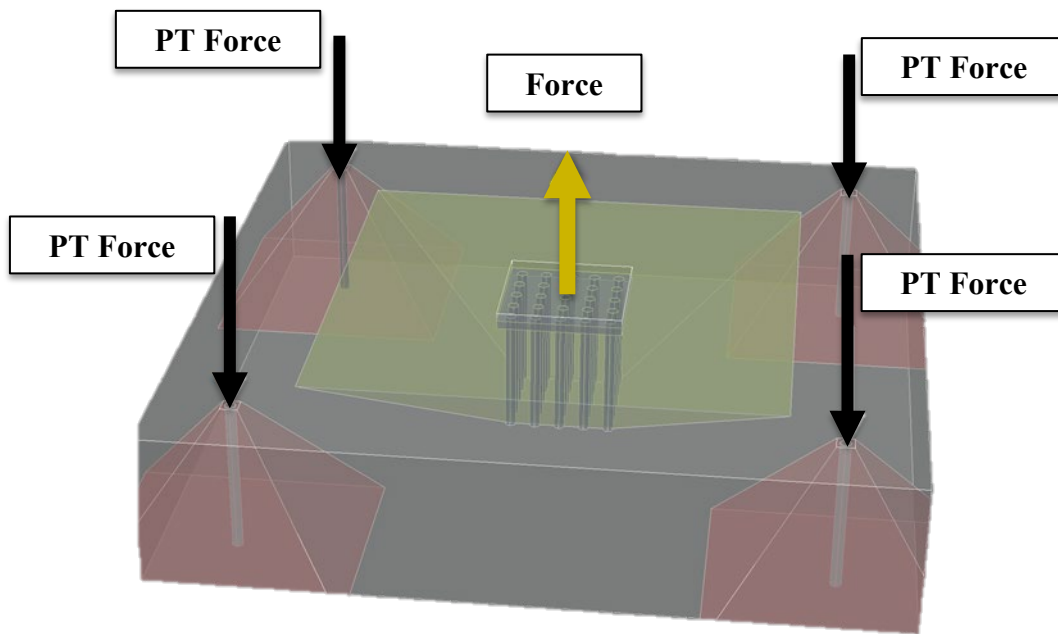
Concrete breakout cone with the effect of post-tensioning forces
